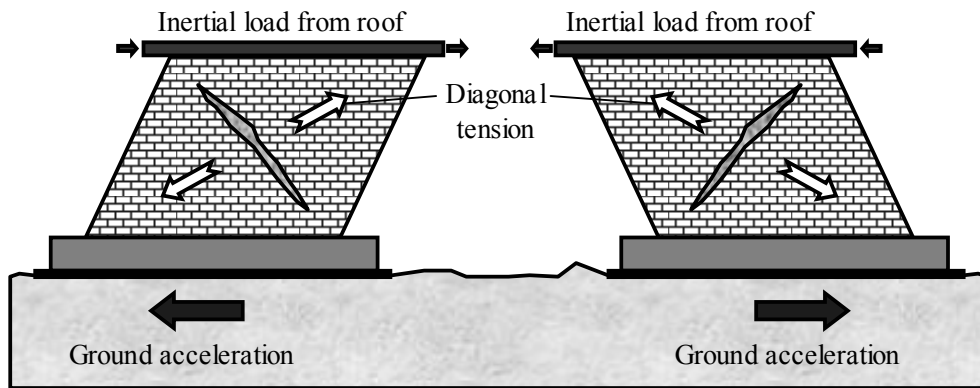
Formation of diagonal cracks in a masonry wall due to earthquake
